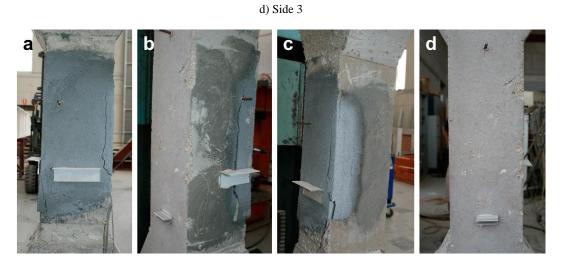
Column failure: Specimen P4B (repaired column with R4-mortar and BA) : a) Side1; b) Side 2; c) Side 4; d)
